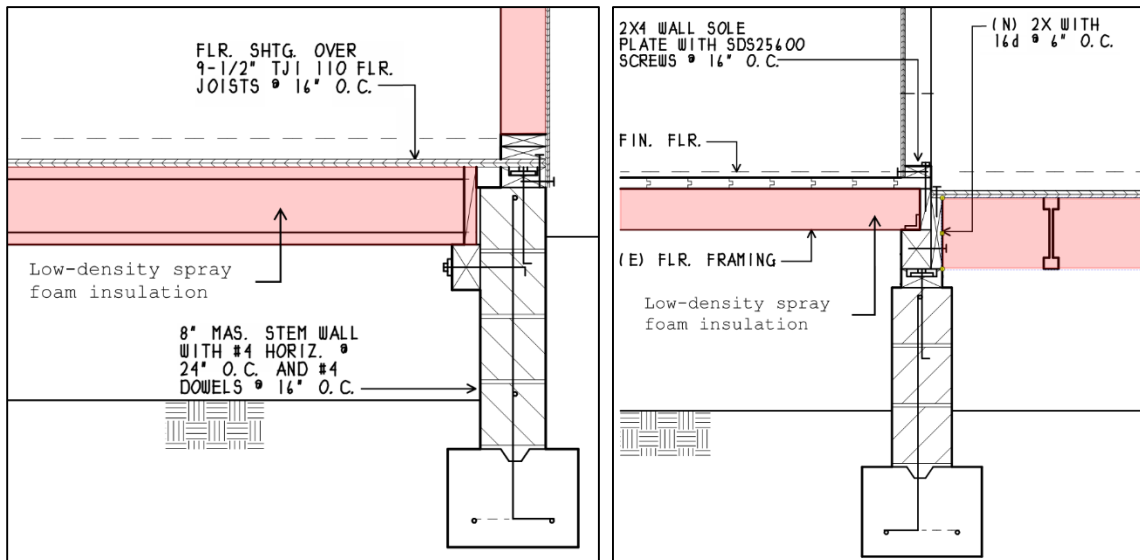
Floor details of new raised floor (left) and intersection between the existing and new floors (right)
